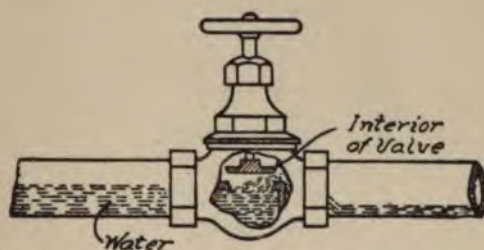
Globe Valve on Horizontal Pipe—Imperfect Drainage.
